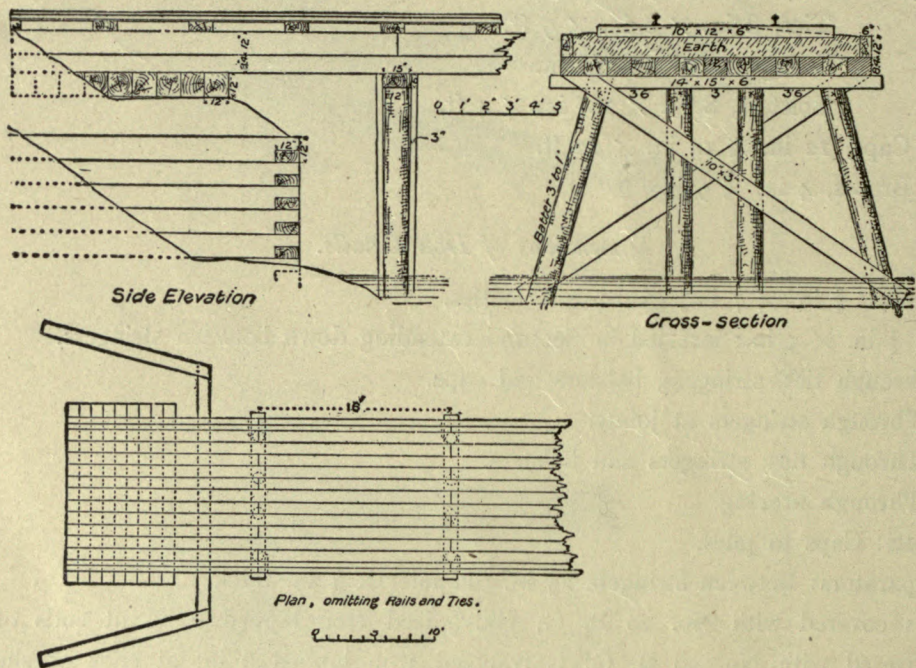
PLATE VIII.—PILE-TRESTLE WITH EARTH ROADBED, LOUISVILLE & NASHVILLE RAILROAD
